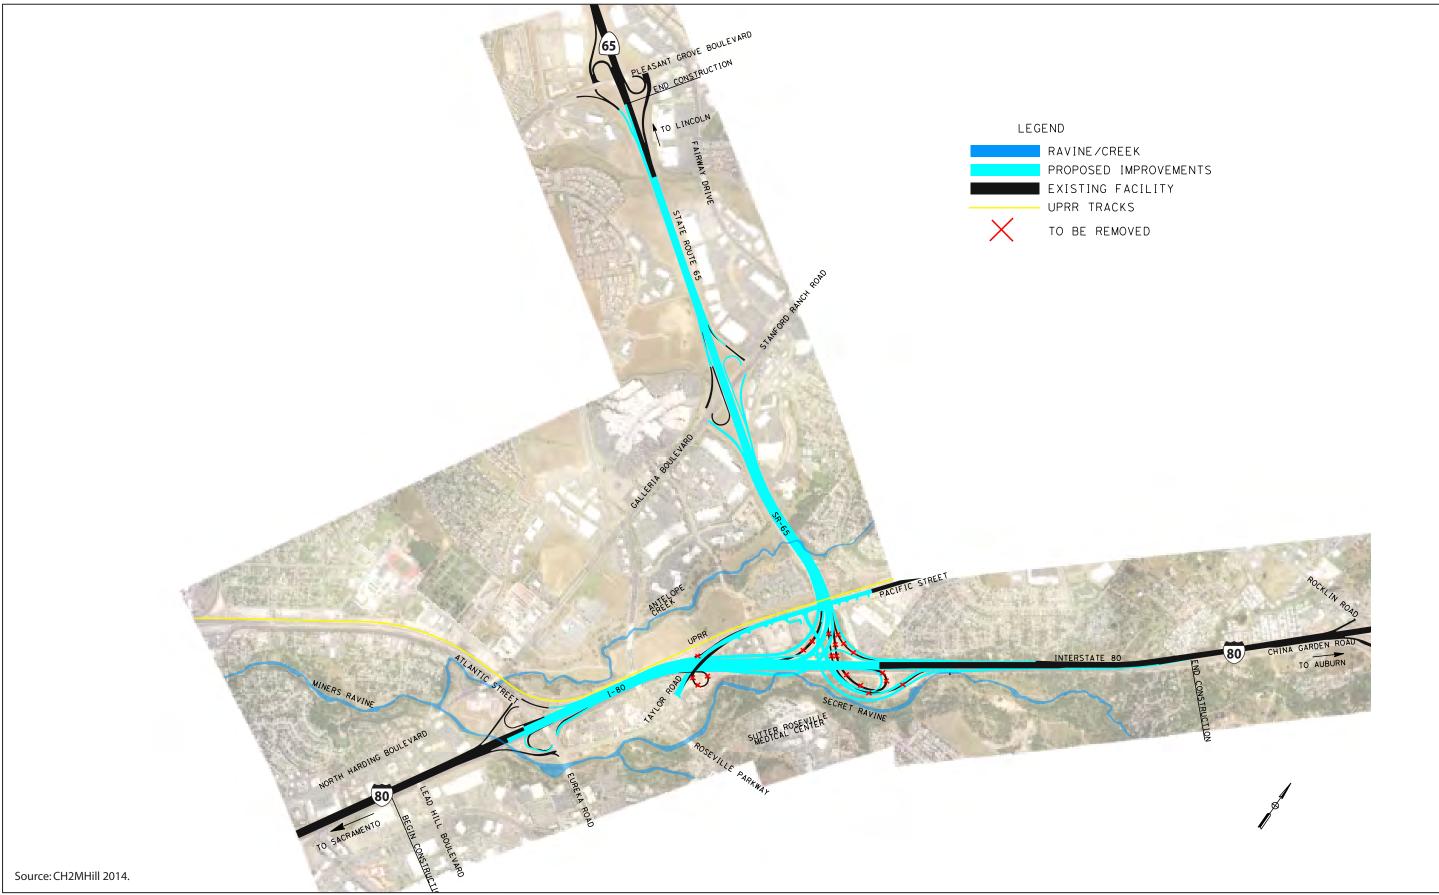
Alternative 1—Taylor Road Full Access Interchange
